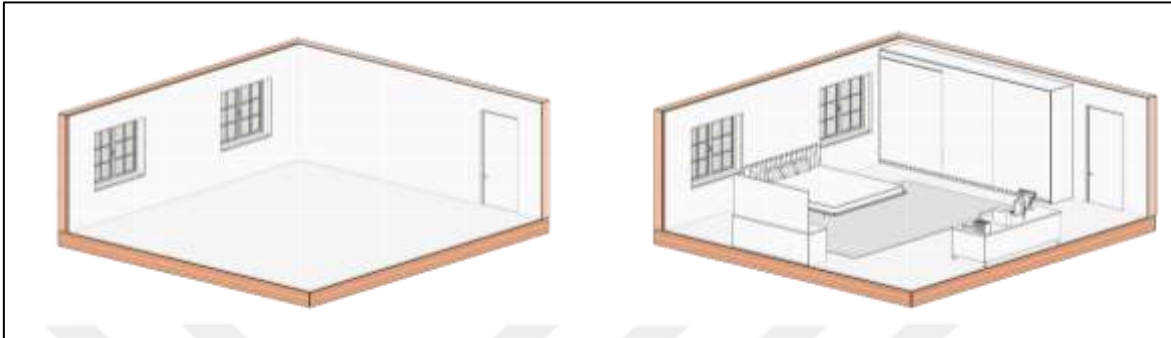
Room Spatial Planning and Furniture Layout (Created by Author).
